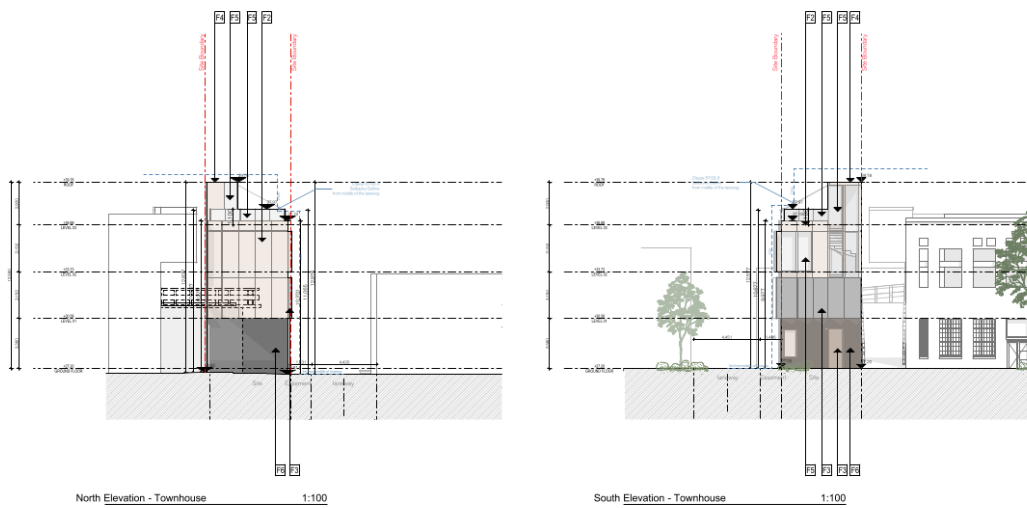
Proposed side elevations - 9 Victoria Street (Townhouses)
